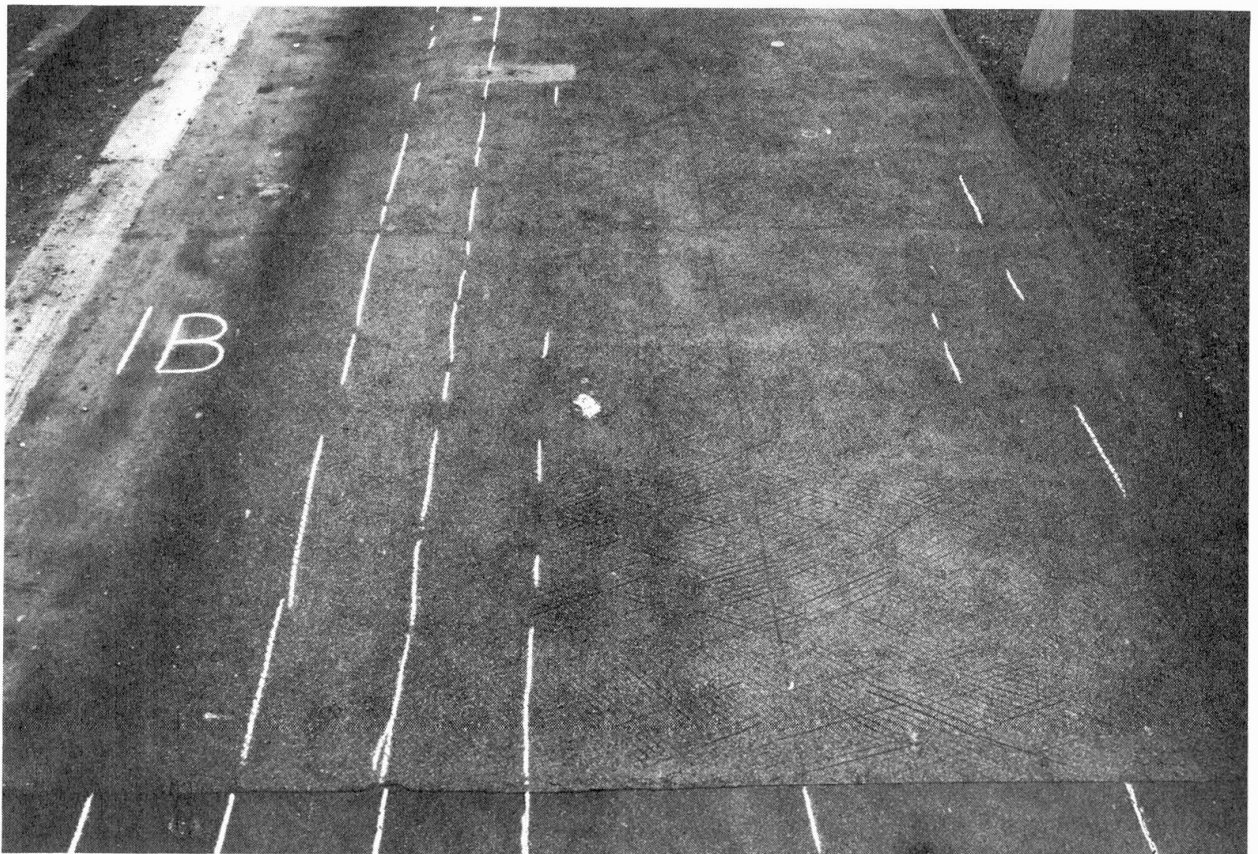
CRACKING IN EPOXY RESIN SURFACING ON SECTION 1B, NOVEMBER, 1967
